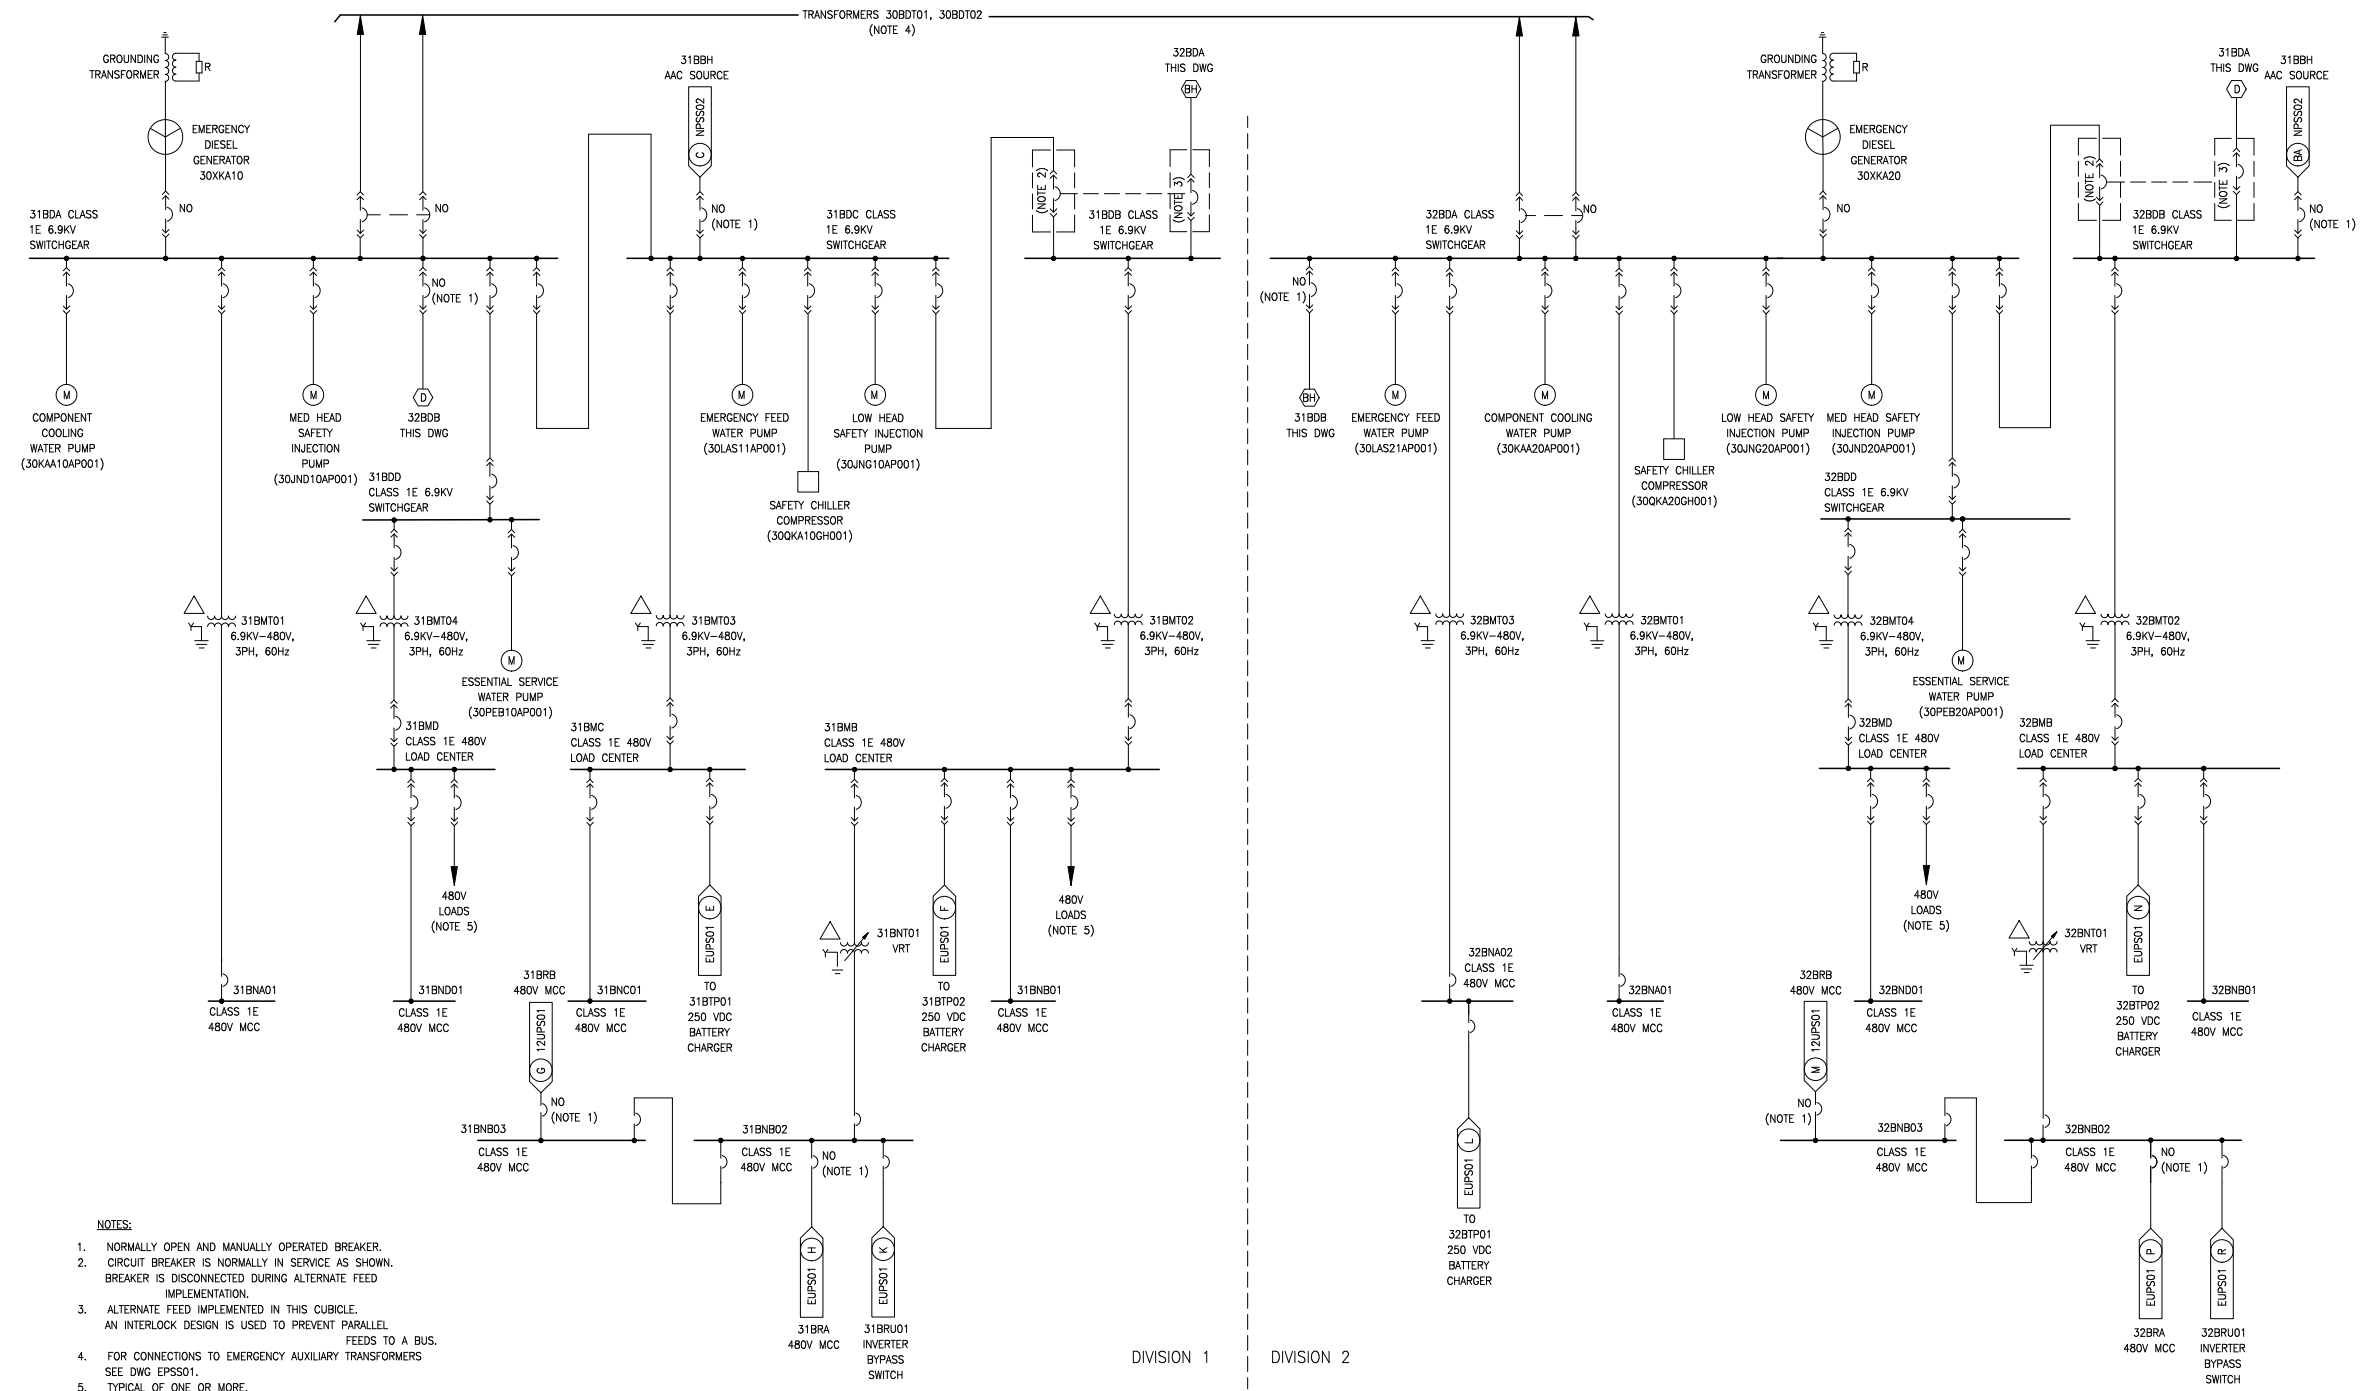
Emergency Power Supply System Single Line Drawing
